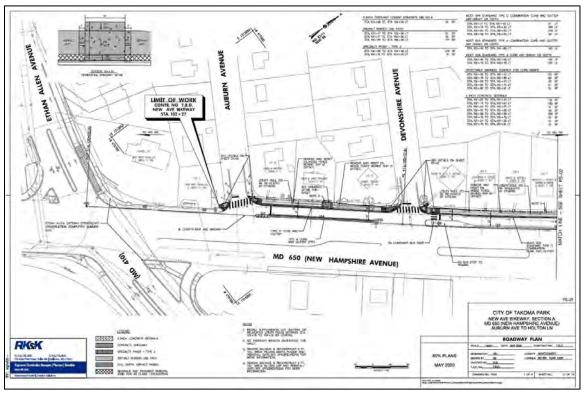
Plan View of Proposed New Avenue Section A Improvements (Part 1)
